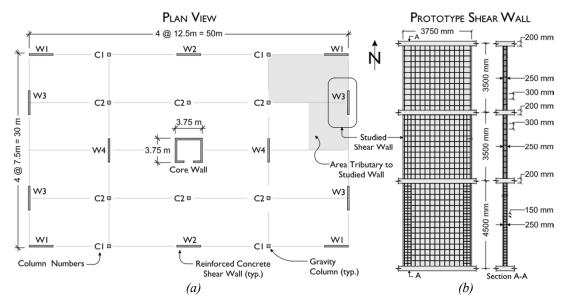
Prototype RC shear wall structure: (a) plan view, (b) typical shear wall detail.
